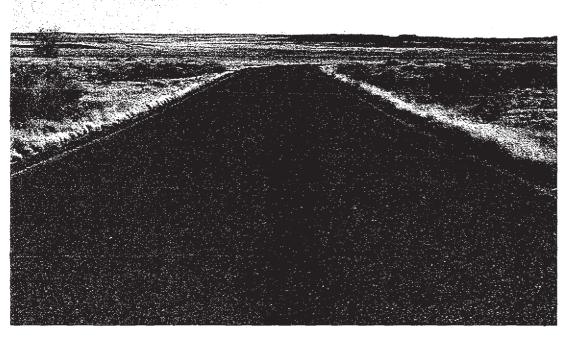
MP 1.50 - Typical Pavement Section, Looking Back
